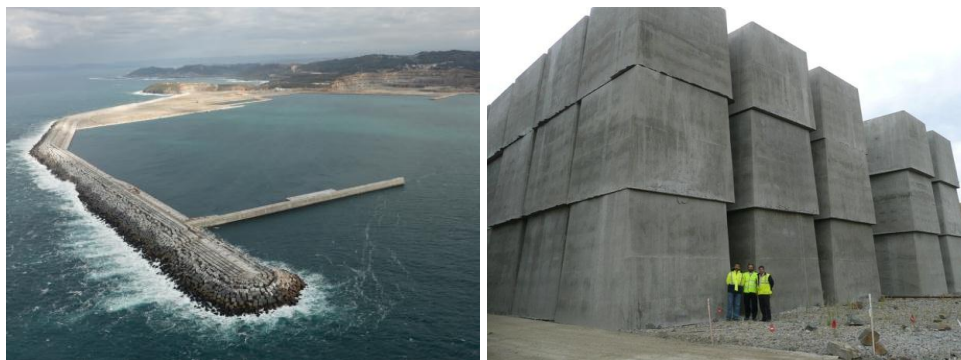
Breakwater heads with concrete cubes at Langosteira, Spain, 2011
